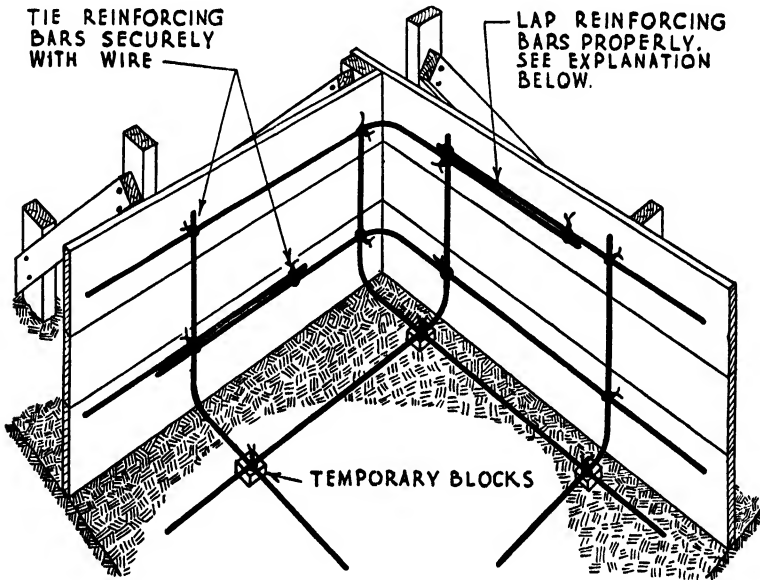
Reinforcing bars should be carefully lapped at the joints and securely tied and supported in place to ensure proper location after the concrete is poured. (Portland Cement Association)
